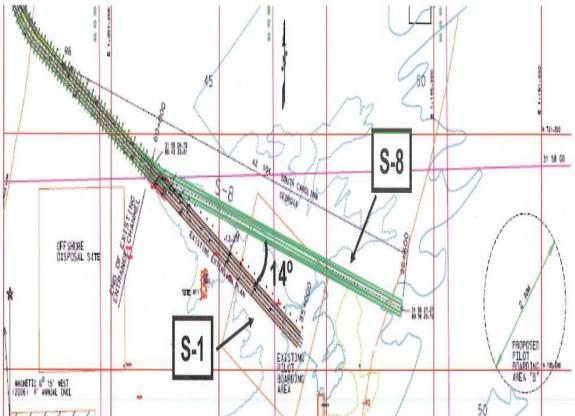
Reconfigured Ocean Bar Channel Alignment. (S-1) Existing Extension Plan, (S-8) Proposed Extension Plan
